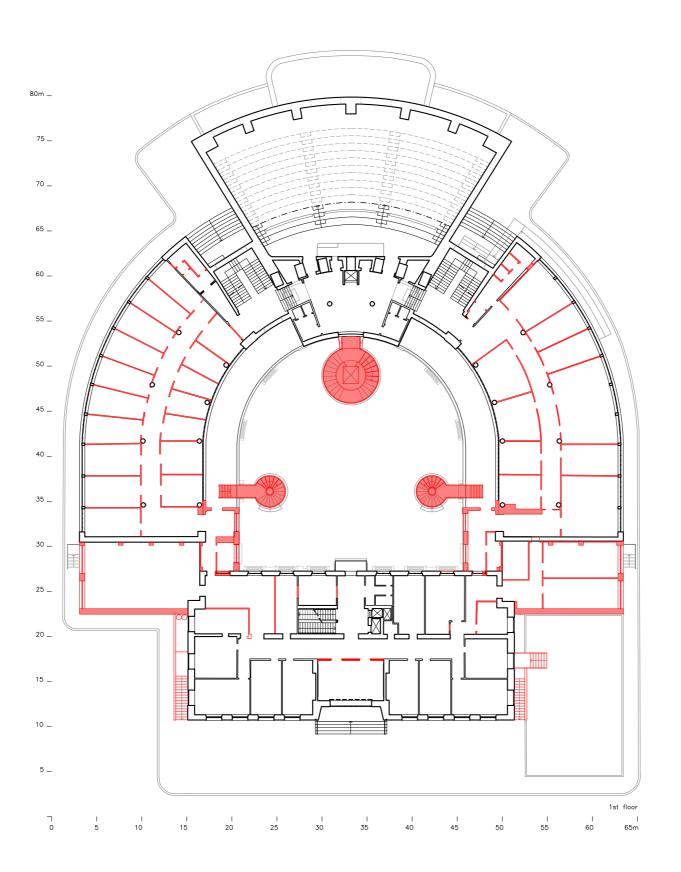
Additions to the building from 1939 to 2021; plan of the first floor (© Cortesi 2020)
